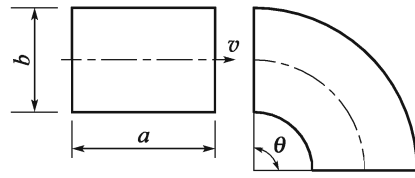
1-2 Sketch of 90° rectangular duct bending
